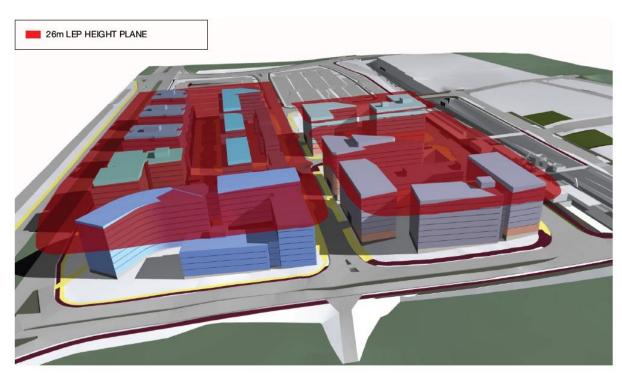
Plan looking west showing small areas of buildings above 26m height limit
